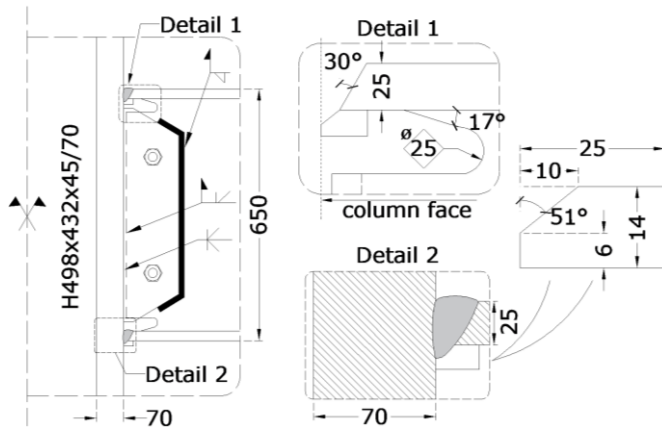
Test specimen beam-to-column connection detail (units: mm)
